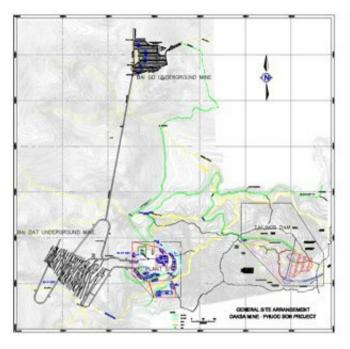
Project Site Plan for Bai Dat (South) and Bai Go (North) deposits
